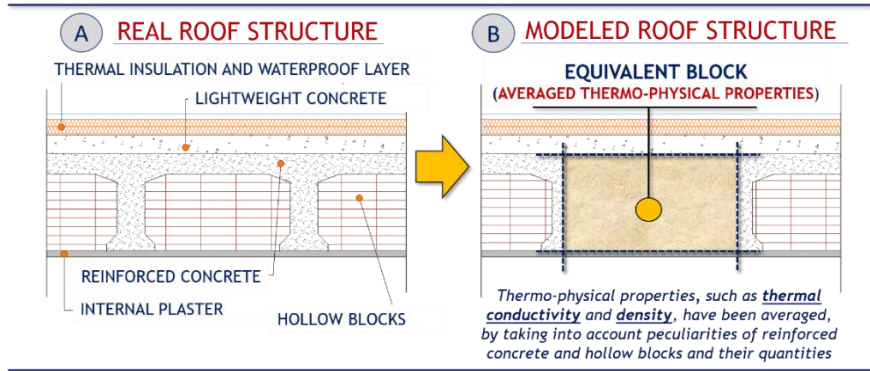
Mixed brick - reinforced concrete structure of the roof: a) Real structure; b) Modeled structure
